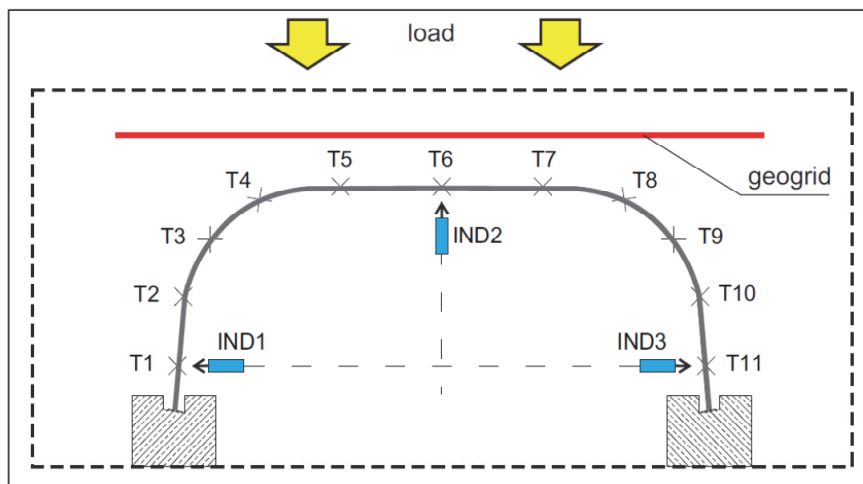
Arrangement of strain and induction gauges for Box Culvert structures.
